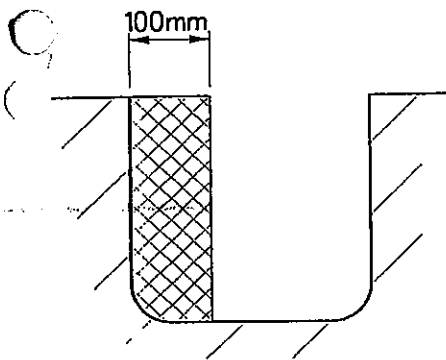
DETAILS OF ESCAPE RAMP IN DRAINAGE CHANNEL FOR AMPHIBIANS
